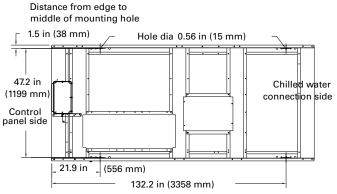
CGAM 30 and 35 ton - service clearances and mounting locations
